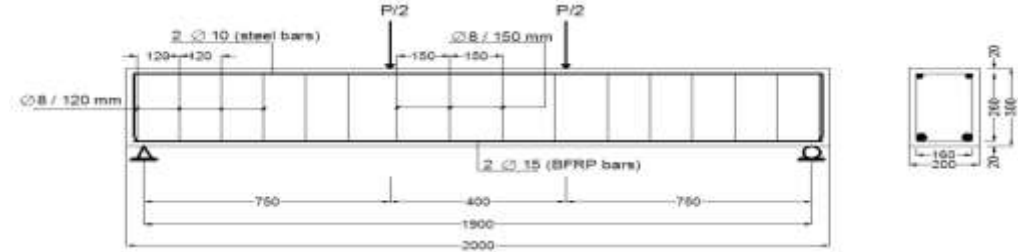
Dimensions and Reinforcement Details of BFRP Bars reinforced Beams (all dimensions in mm)
